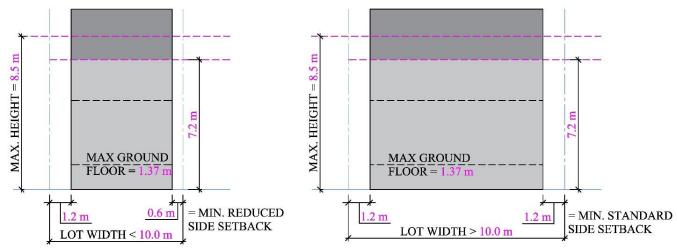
K.F10: Parallel Massing on Pitched Roof Building – Front Elevation
